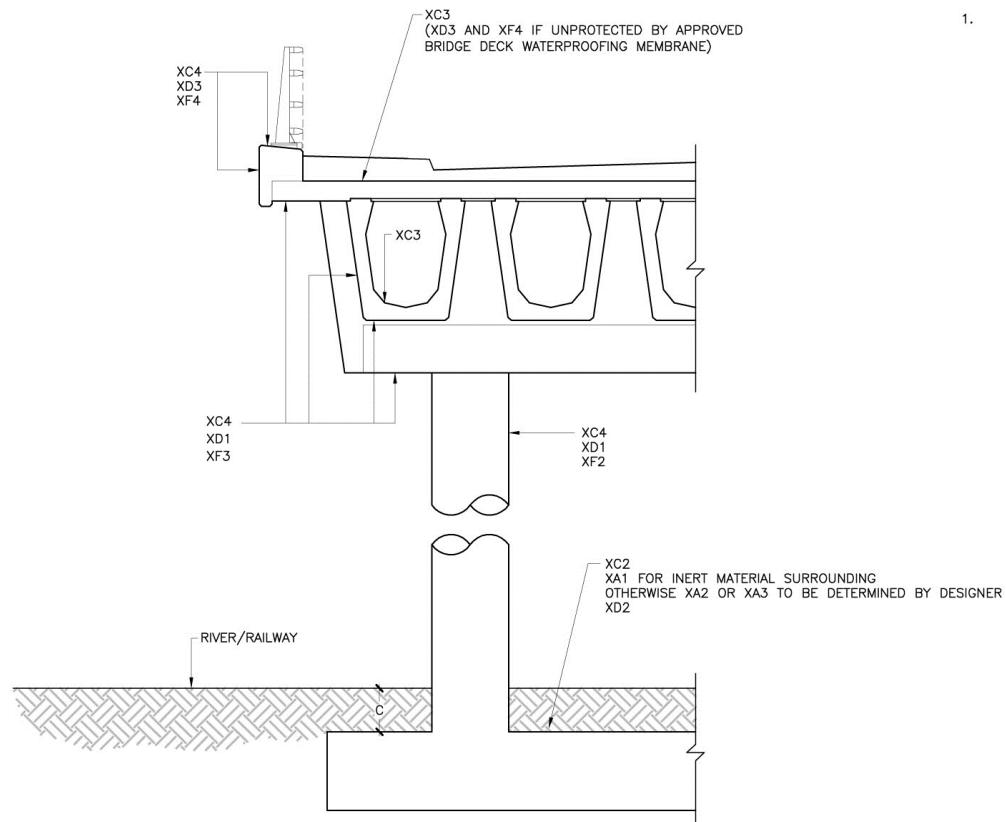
Underbridge Structure (Road Over River / Railway) – Intermediate Support & Deck
